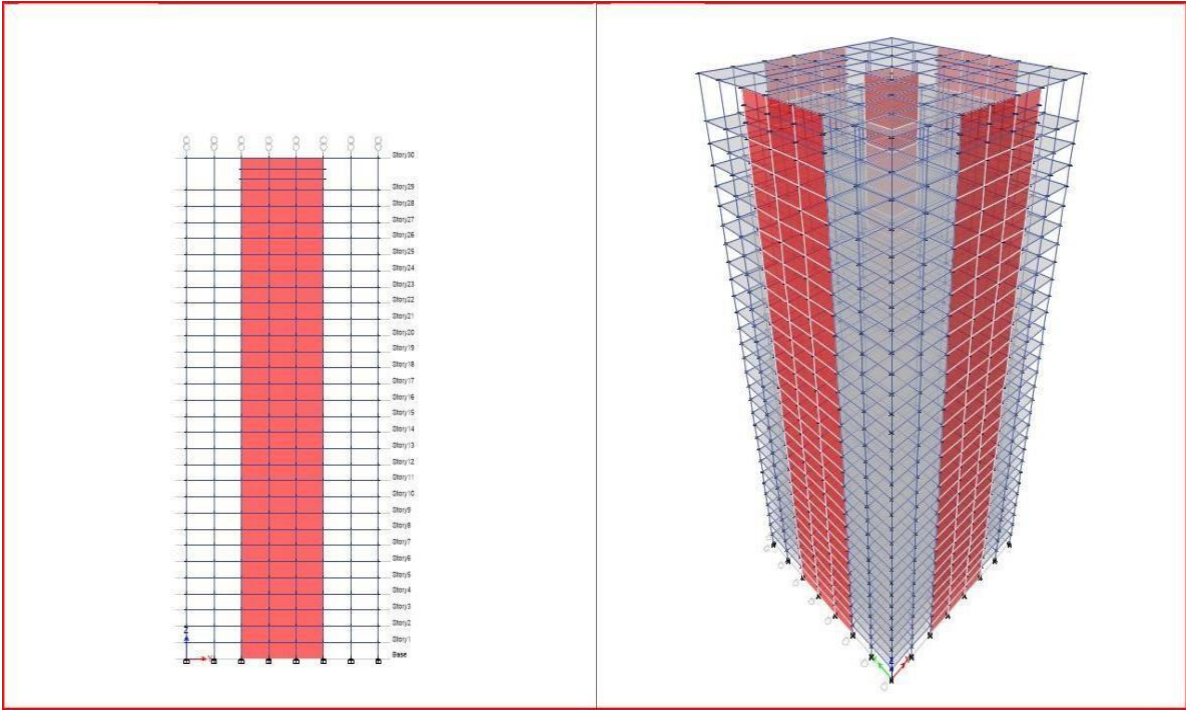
Elevation and 3-D view of Soft Story model with horizontal stiffeners at the top for G+30
